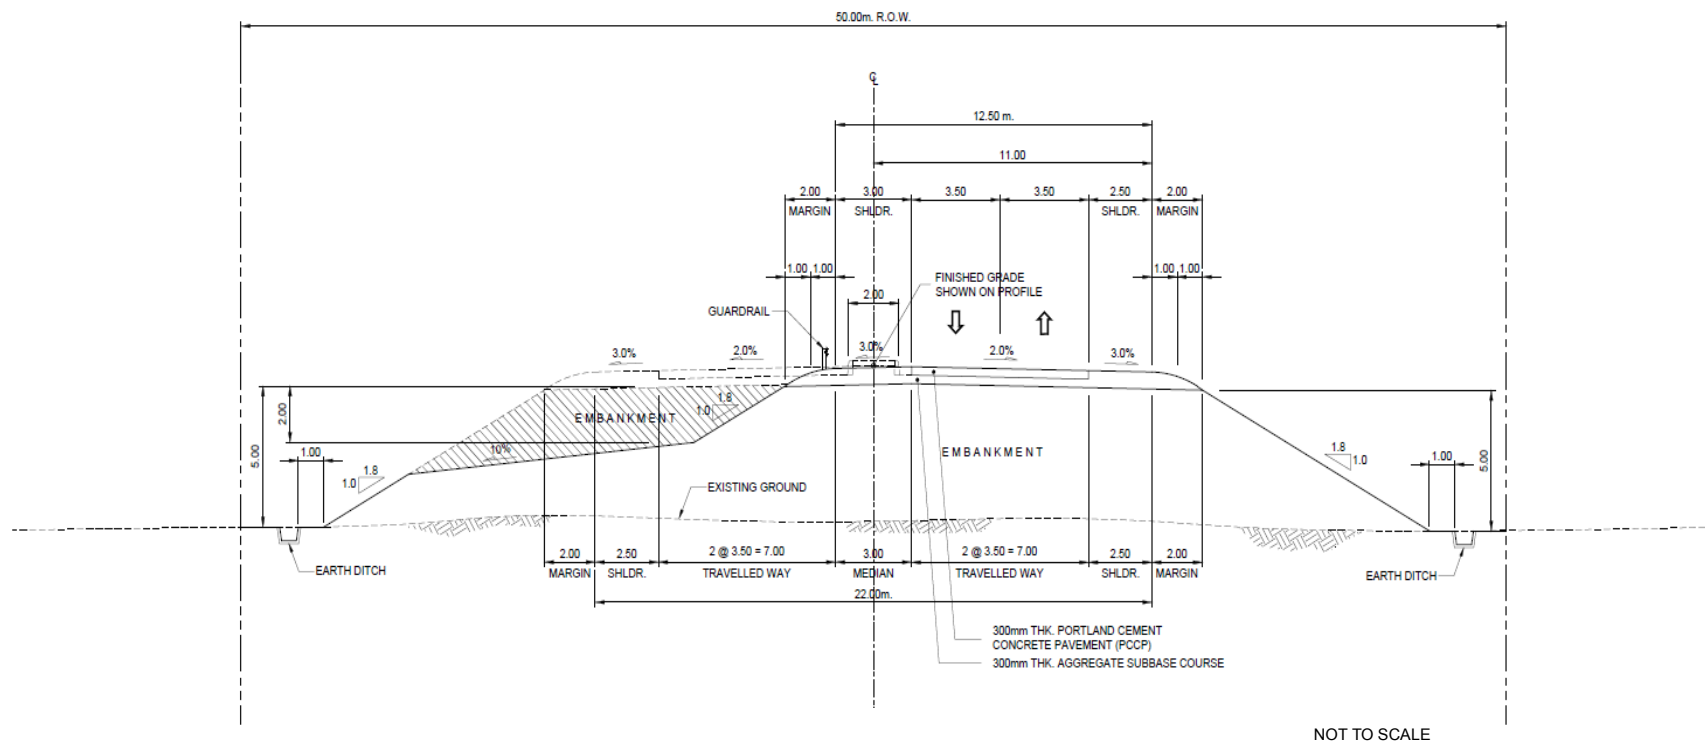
Typical Cross Section of Embankment Section (Initial and Widening Stages)
